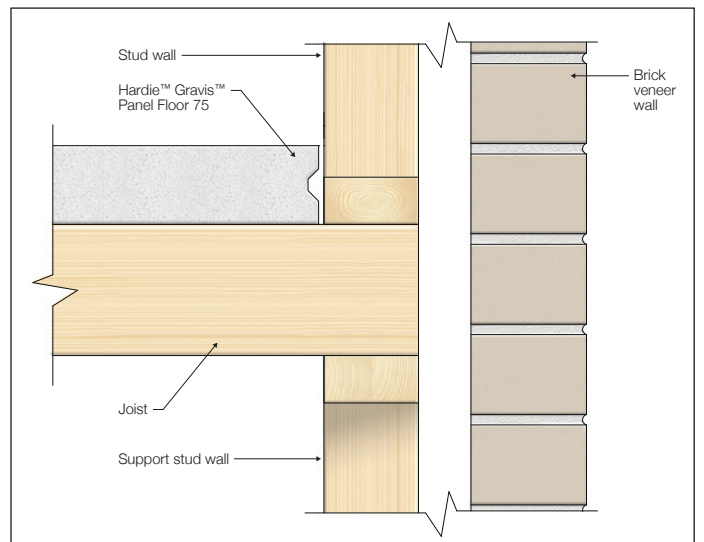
JOIST BLOCKING UNDER LOAD BEARING WALLS PERPENDICULAR TO JOISTS
